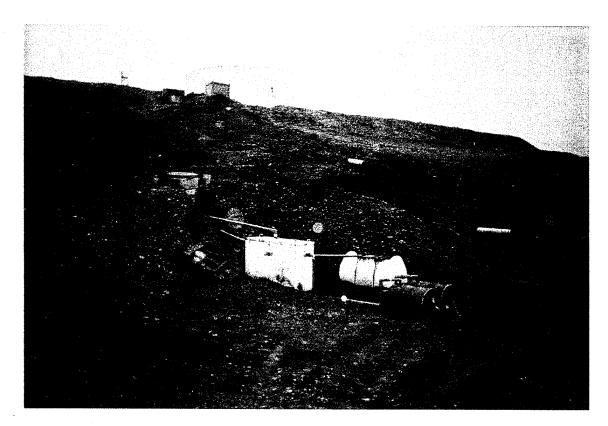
The liner was placed on the bottom and downhill side of the trenches.
